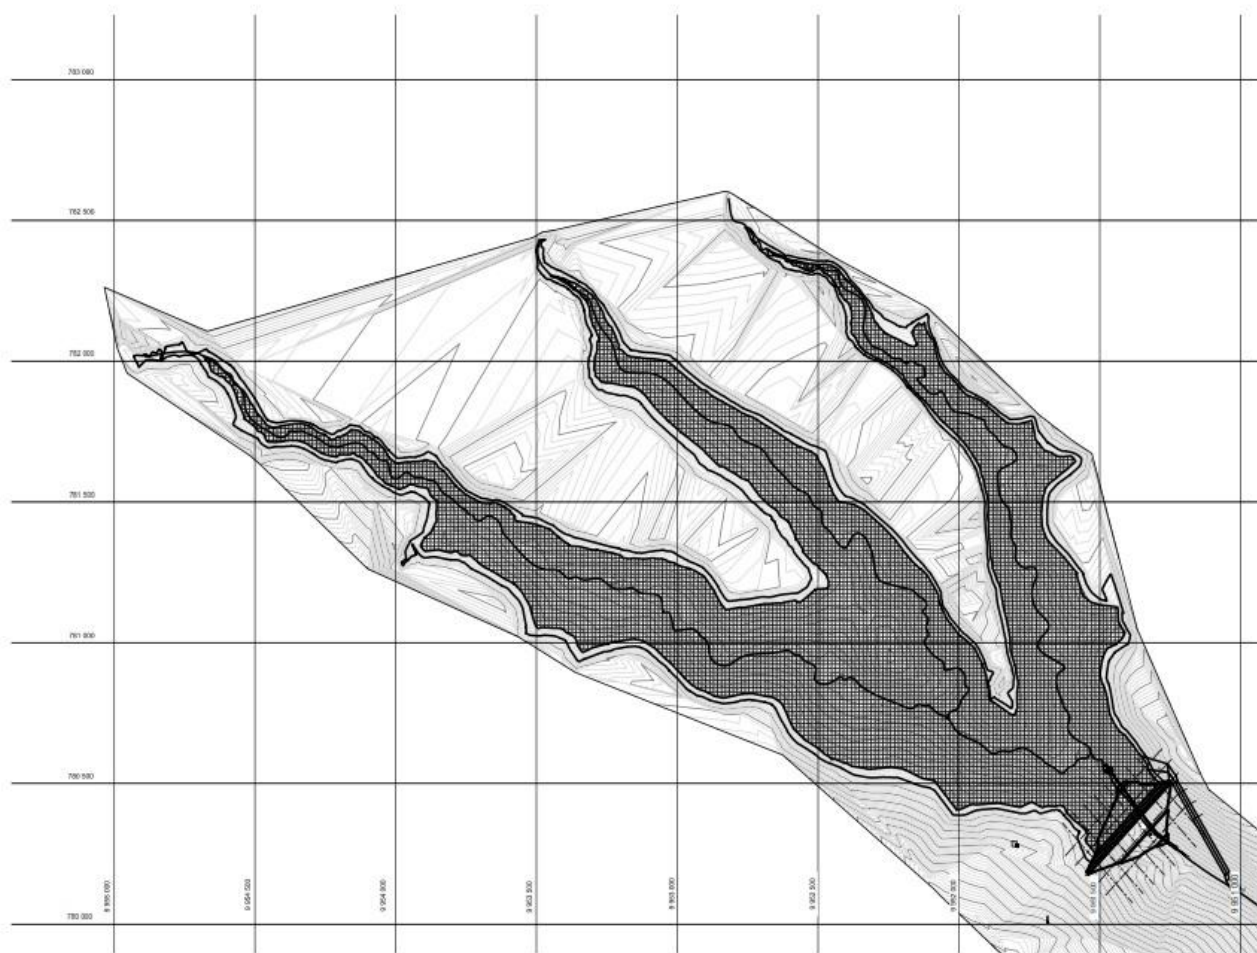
Reservoir Plan-Rockfill Dam Reservoir Plan
